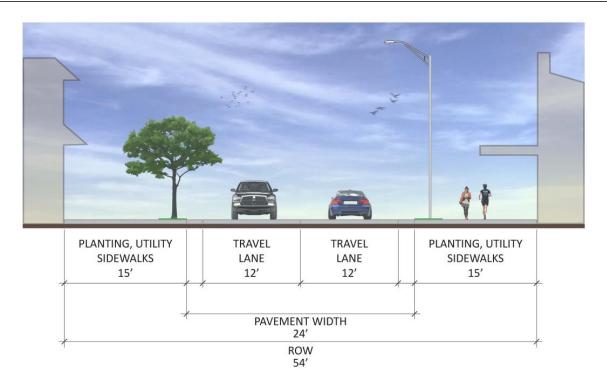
Urban Local Street Cross-Section - Option 1
